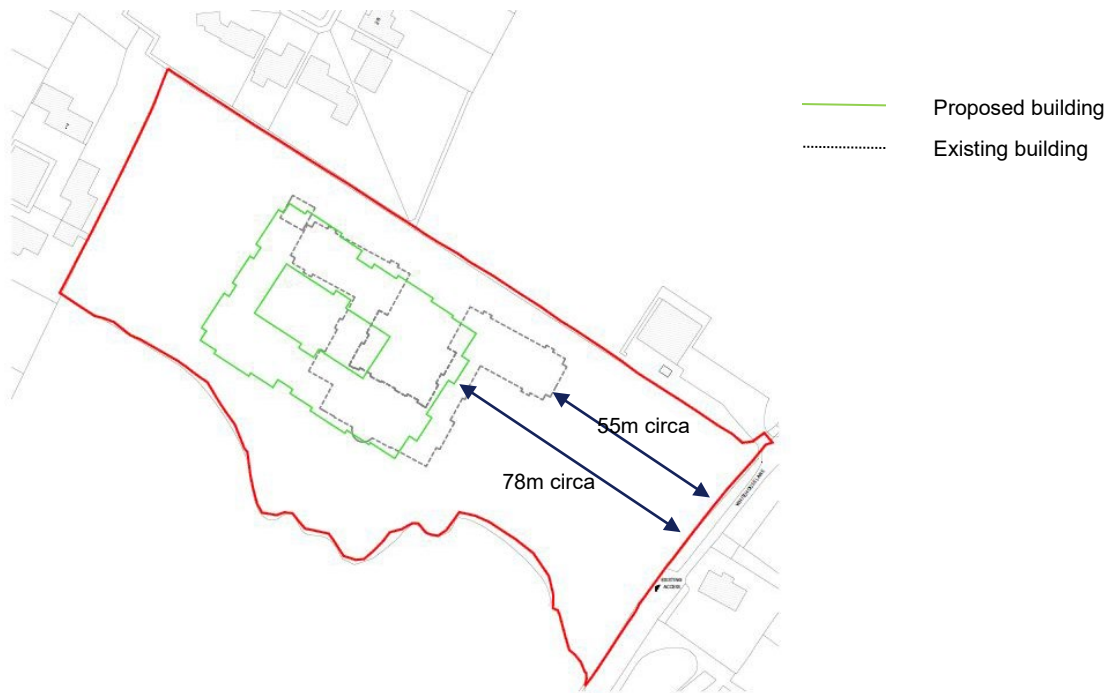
Proposed site layout showing a more compact form and the built form being located closer to Girton
